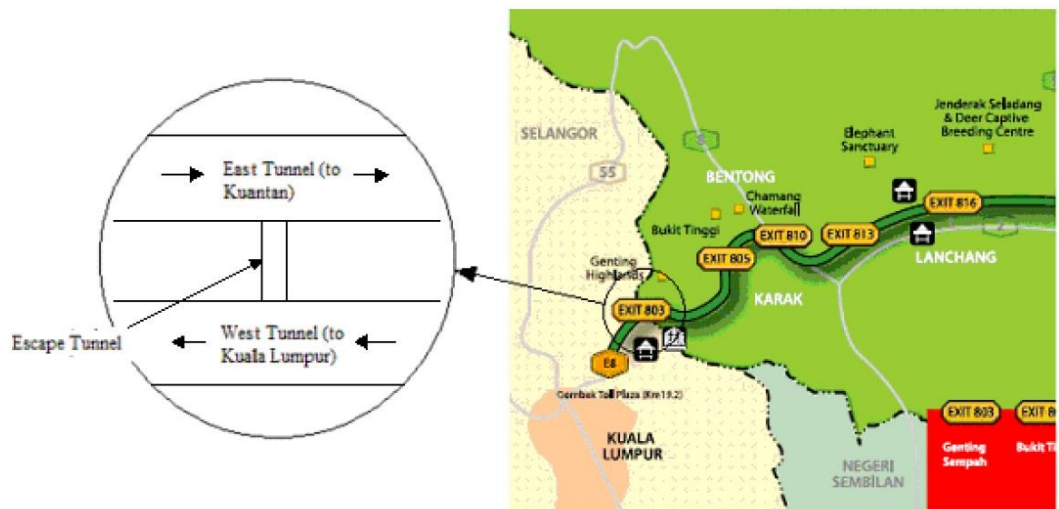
Genting Sempah Tunnel and the plan view location (Source: Shahar & Majid, 2008).
